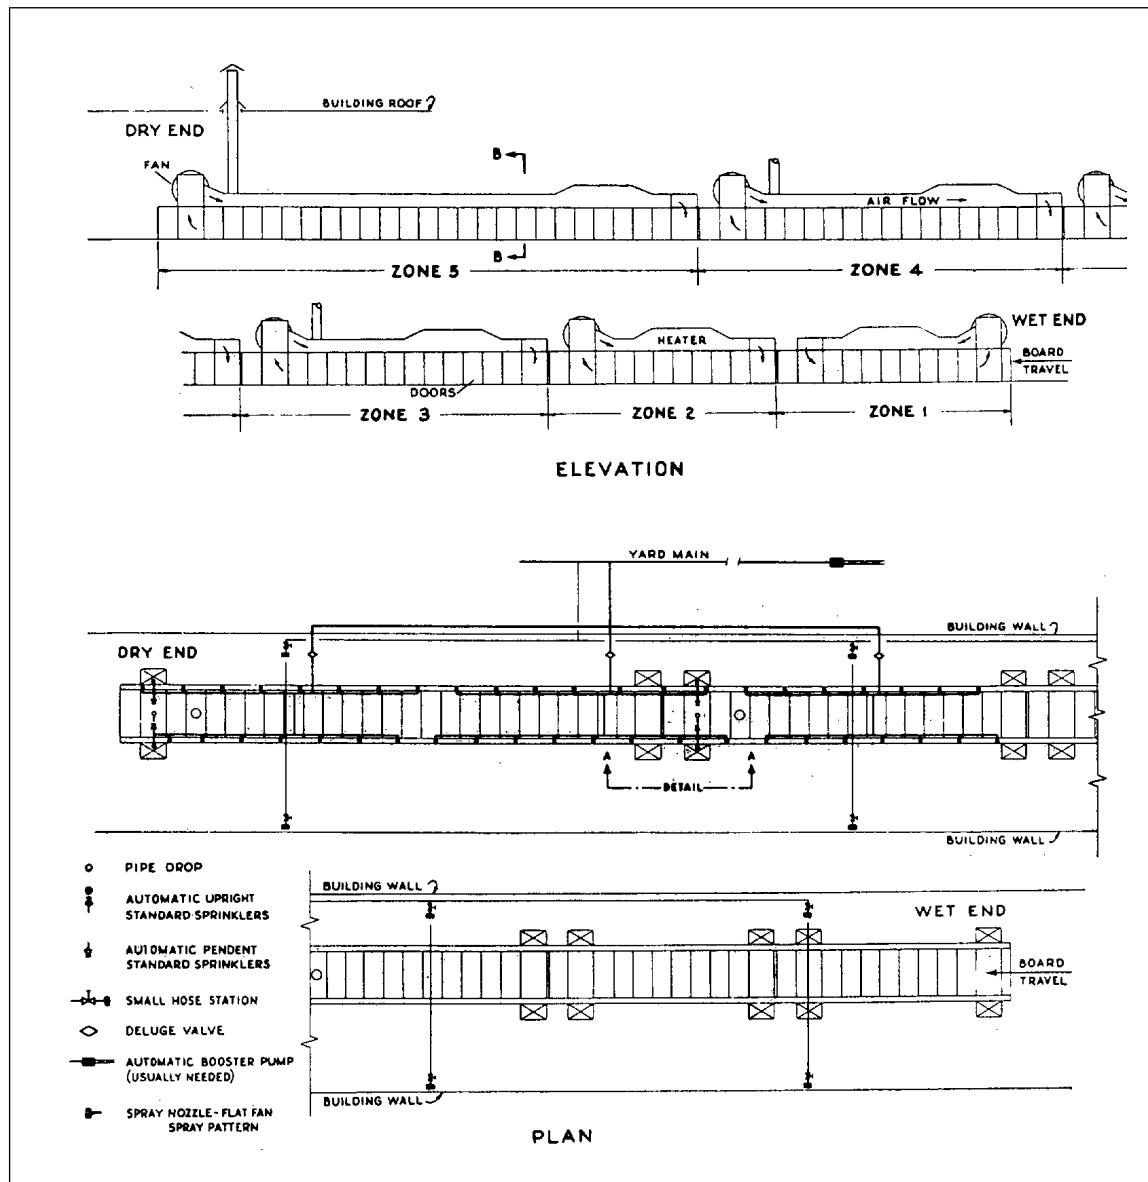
Typical arrangement of spray nozzle protection for multi-tier wood fiberboard or veneer dryer. Dryers, especially fiberboard dryers, can be up to 500 ft (153 m) long. Symbols apply also to Figs. 12–14 showing additional protection details.
